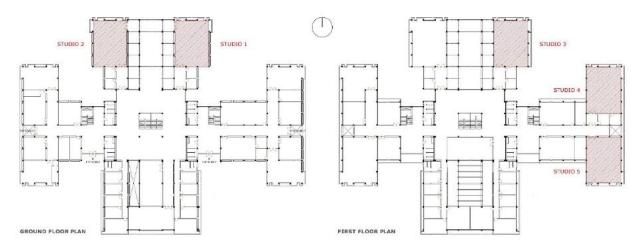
Floor plans of the architecture department, SUE and the locations of the design studios.
